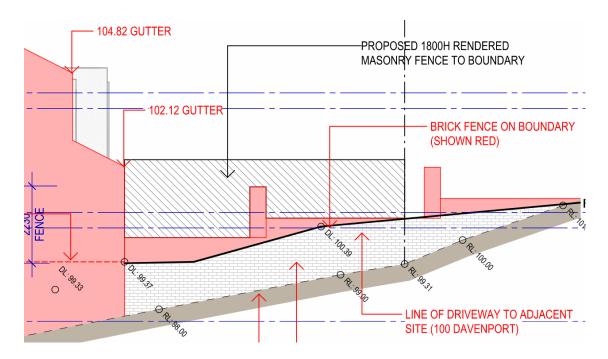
showing the proposed masonry boundary wall in relation to the front elevation and driveway of 100 Davenport Terrace
